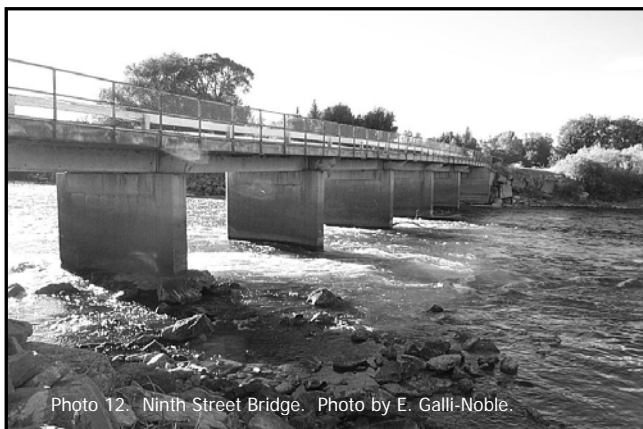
Ninth Street Bridge. Photo by E. Galli-Noble.
